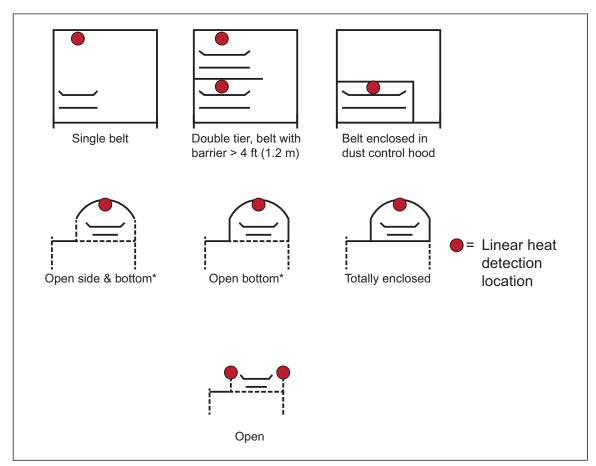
Suggested locations for fire detection in various outdoor conveyor arrangements
